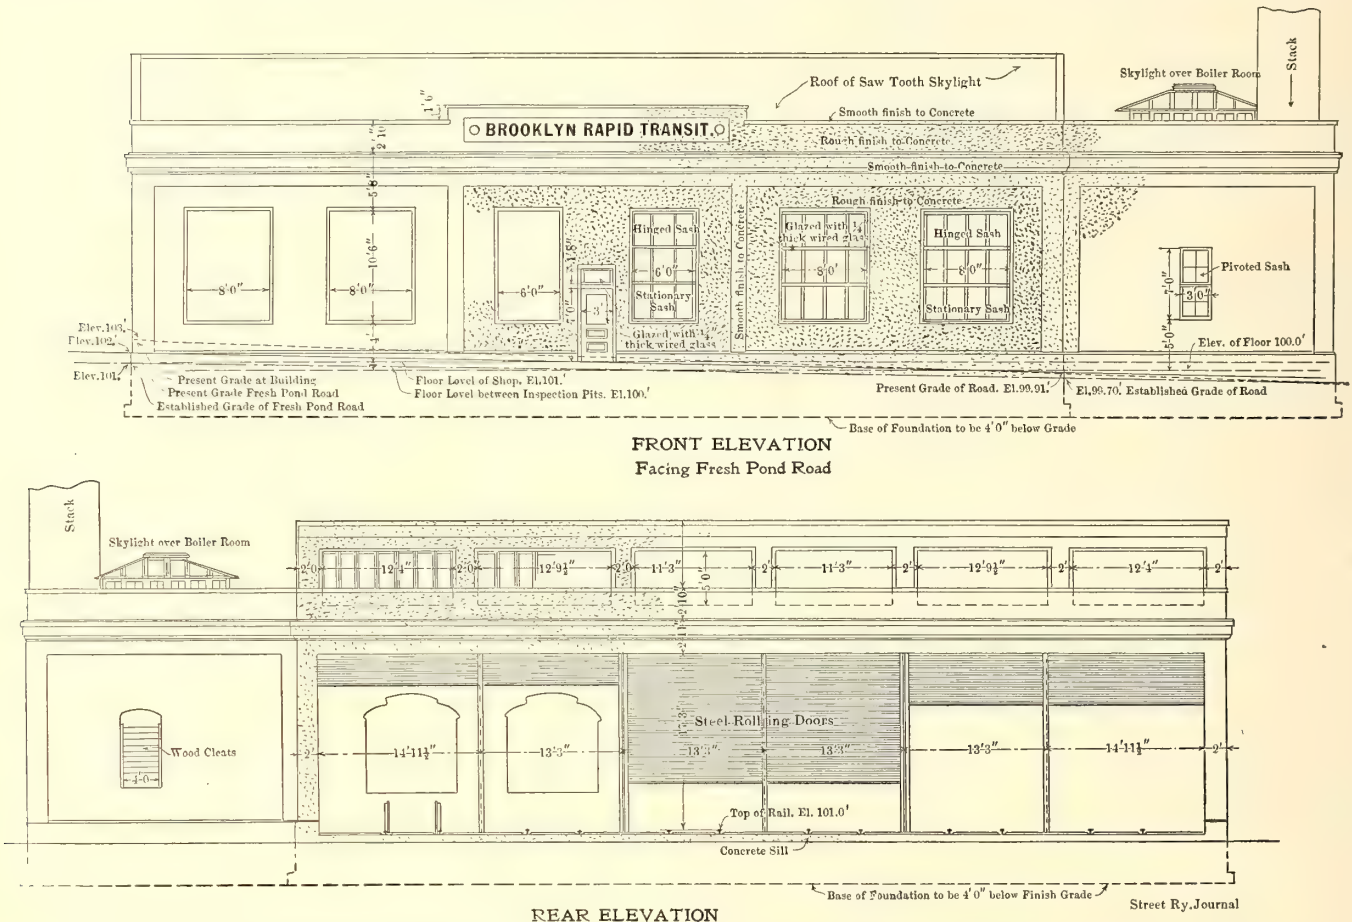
REAR AND FRONT ELEVATIONS OF THE LUTHERAN ELEVATED RAILWAY INSPECTION PLANT OF THE BROOKLYN RAPID TRANSIT COMPANY
